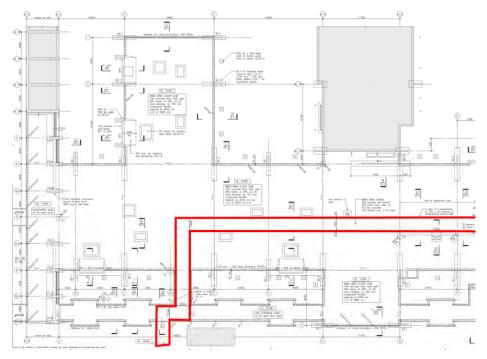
SSU Ward area ground floor plan (red lines indicate extent of service tunnels)
